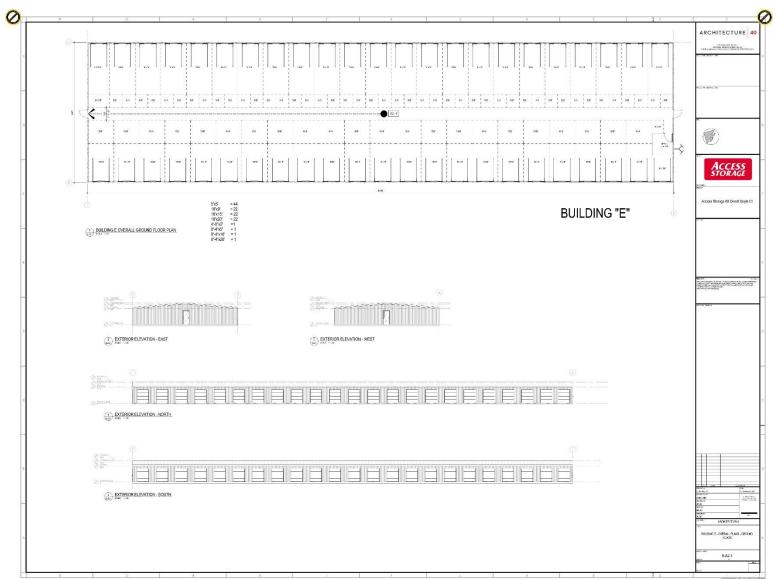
Proposed Building Elevations and Floor Plans - Building E (prepared by Architecture 49, dated November 11, 2022)
